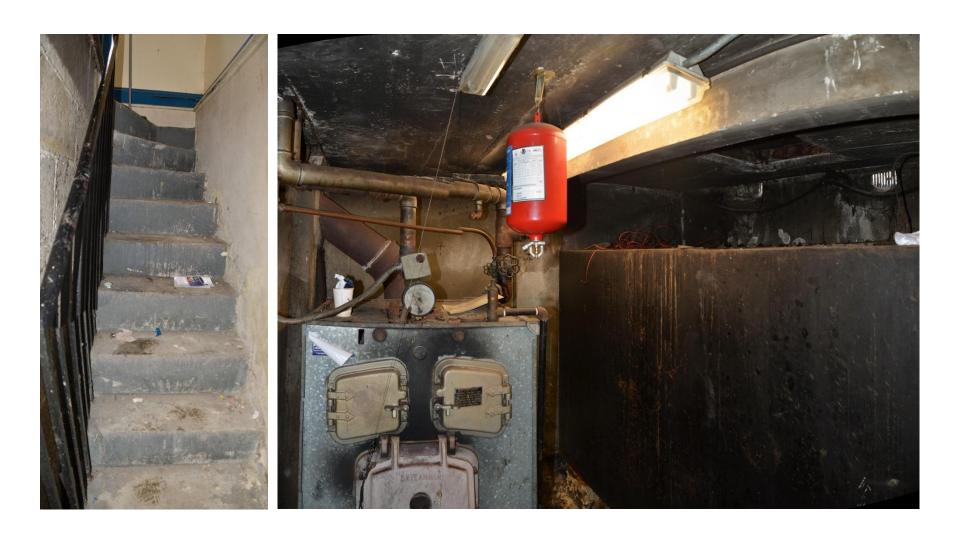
A – Above - Internal concrete service stair to Boiler room.
